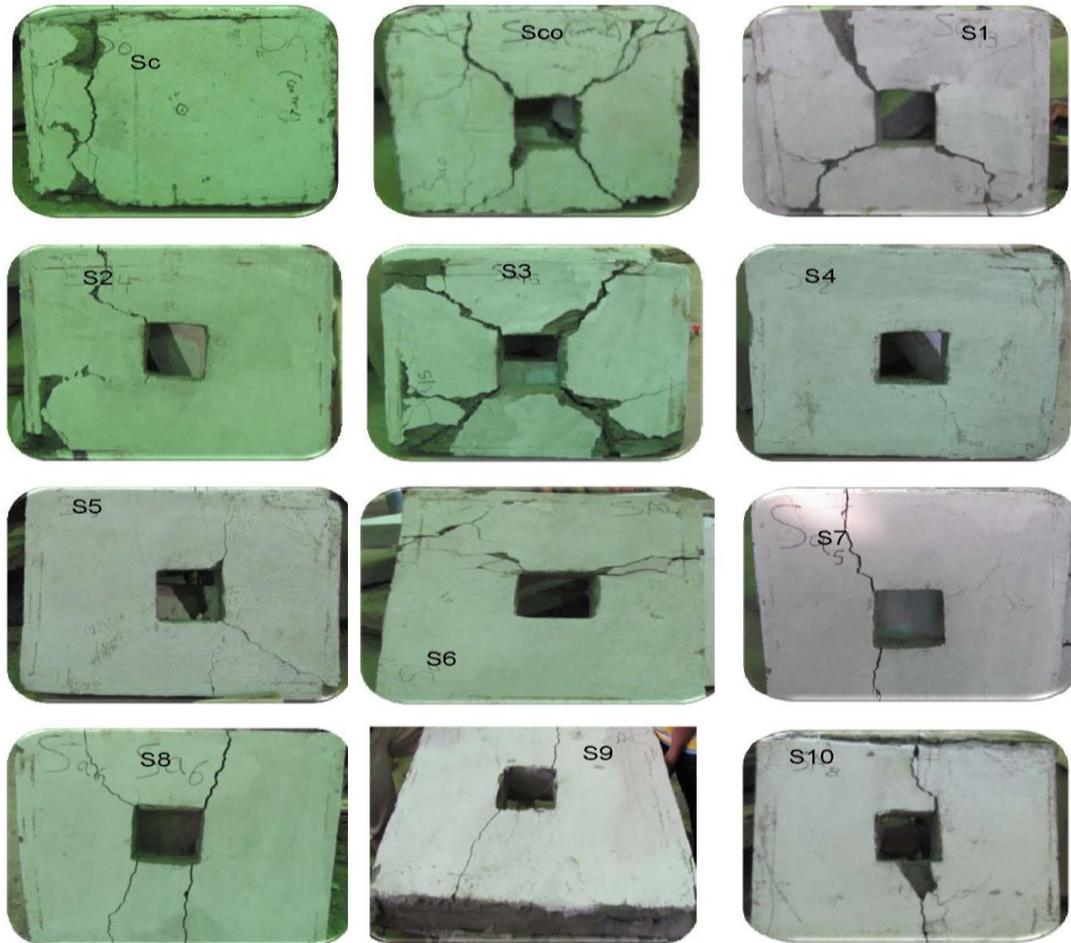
CRACKING PATTERN OF THE TEST SPECIMENS
